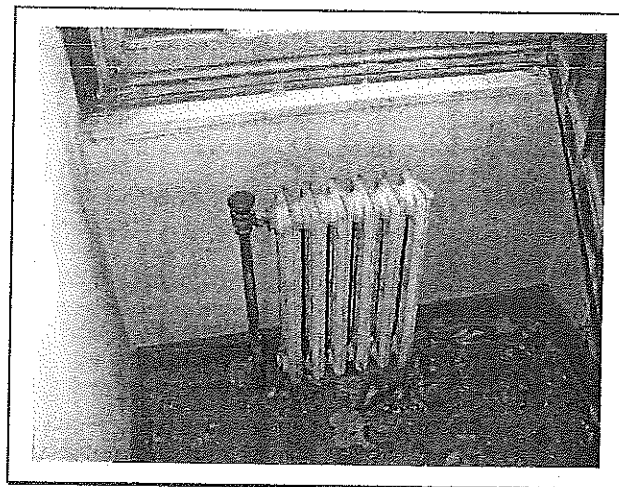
Viewing white radiator, 1st floor – Adam's building and Women's restroom, Basement – NW offices.
